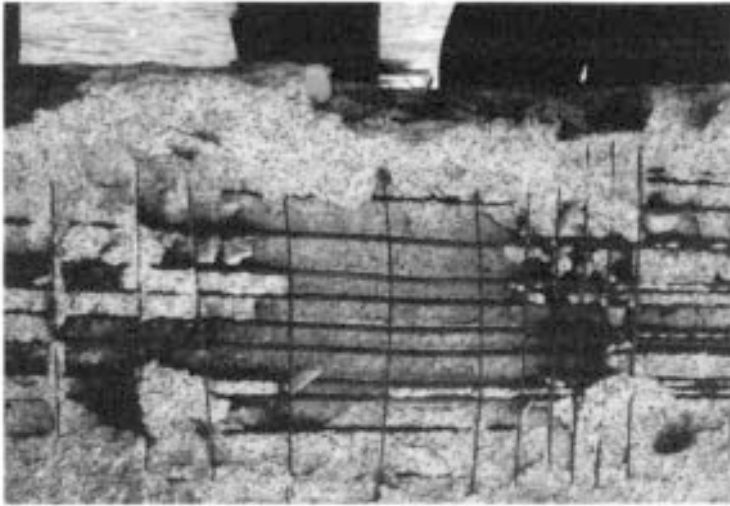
Serious damage to concrete jetty by hydro-carbon fire. Courtesy, Burks Green & Partners Consulting Engineers.
